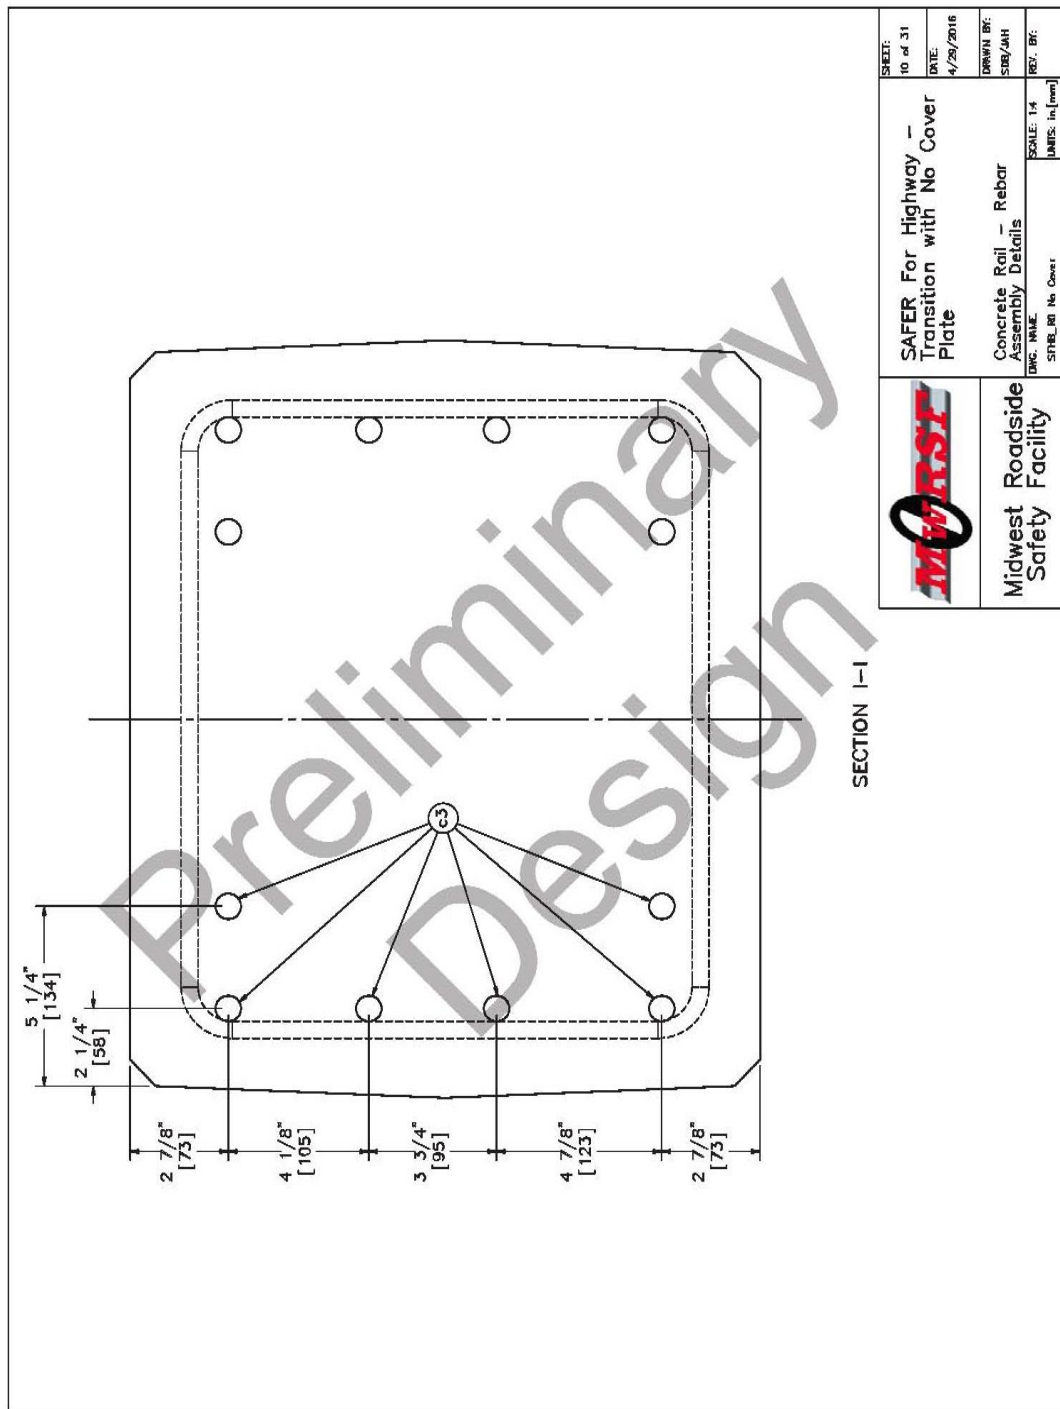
Concrete Rail Rebar Assembly Details, No Cover Plate, RESTORE Barrier Transition
